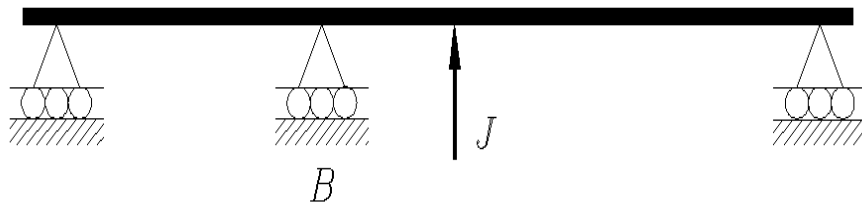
Bearing(B) and jack(J) position for jack-up measurement
